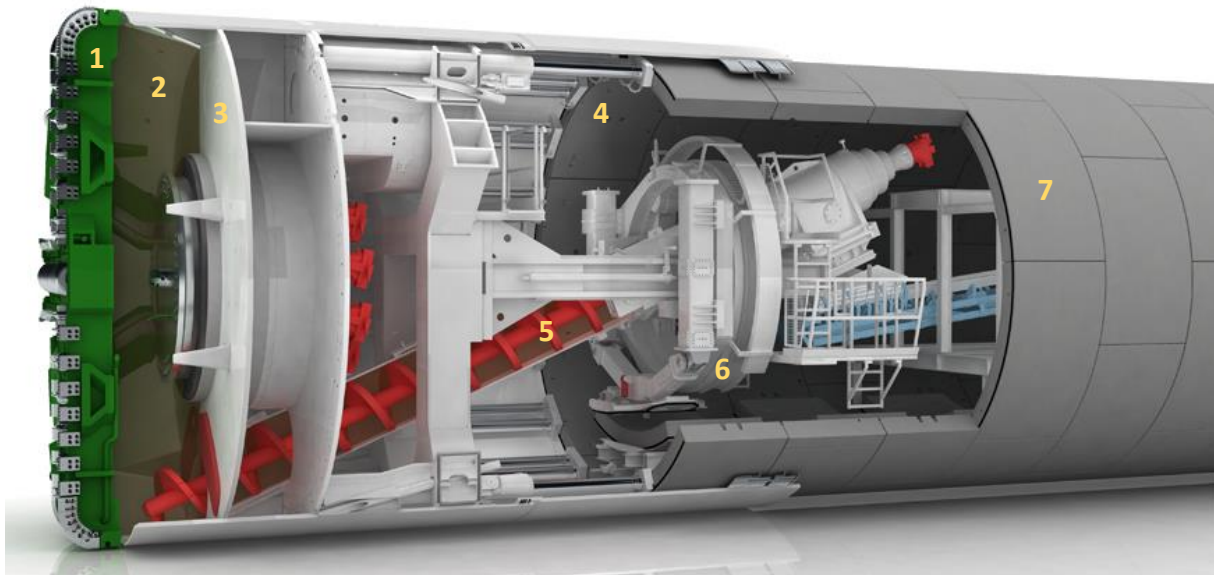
Longitudinal cut through an EPB shield (1 cutting wheel, 2 excavation chamber, 3 bulkhead, 4 thrust jacks, 5 screw conveyor, 6 segment erector, 7 segmental concrete lining) (HERRENKNECHT AG (2014))
